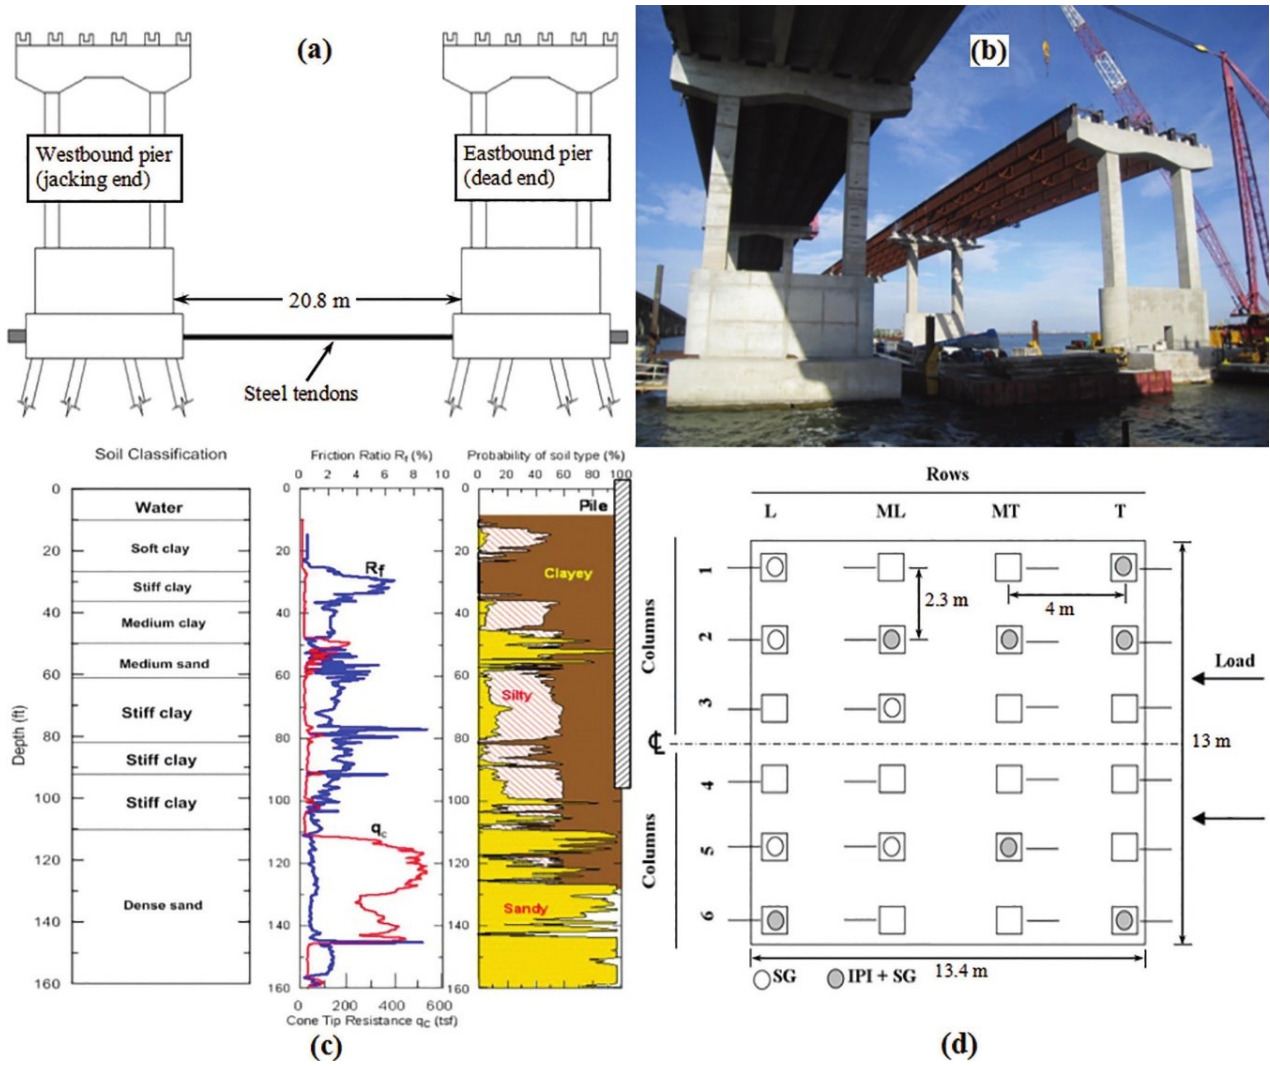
(a) Illustration for the lateral load test of M19 pier foundation, (b) test site, (c) soil layering and cone penetration test profiles, and (d) pile cap plan and pile labeling (Abu-Farsakh et al., 2017).
